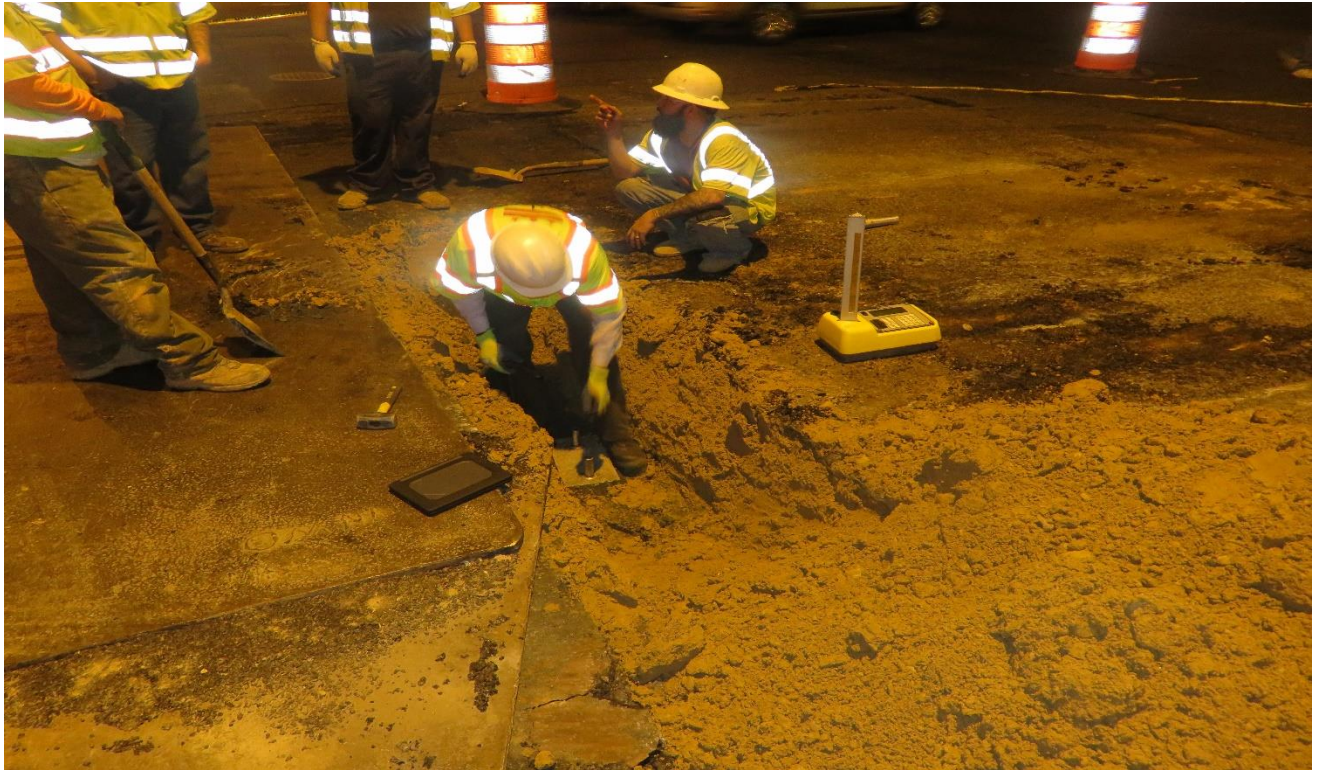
02/21/2018 – Water main trench backfill conducting compaction test.
